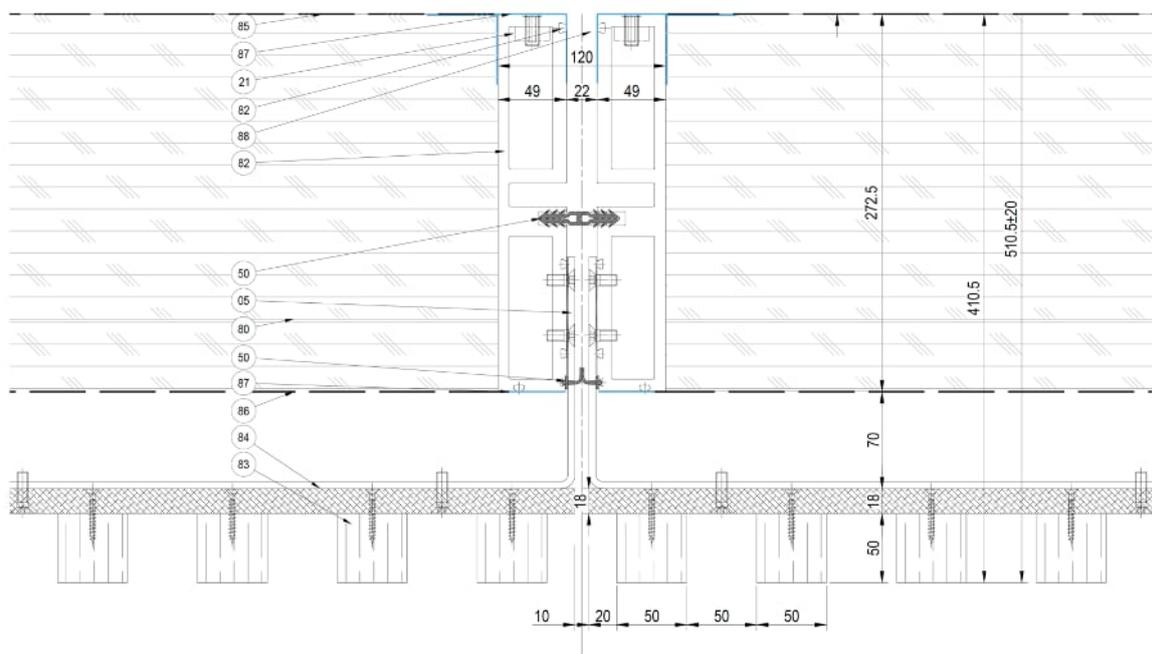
Final solution: horizontal section Basajaun opaque façade module. The numbers for the components' identification refer to Table 19.
